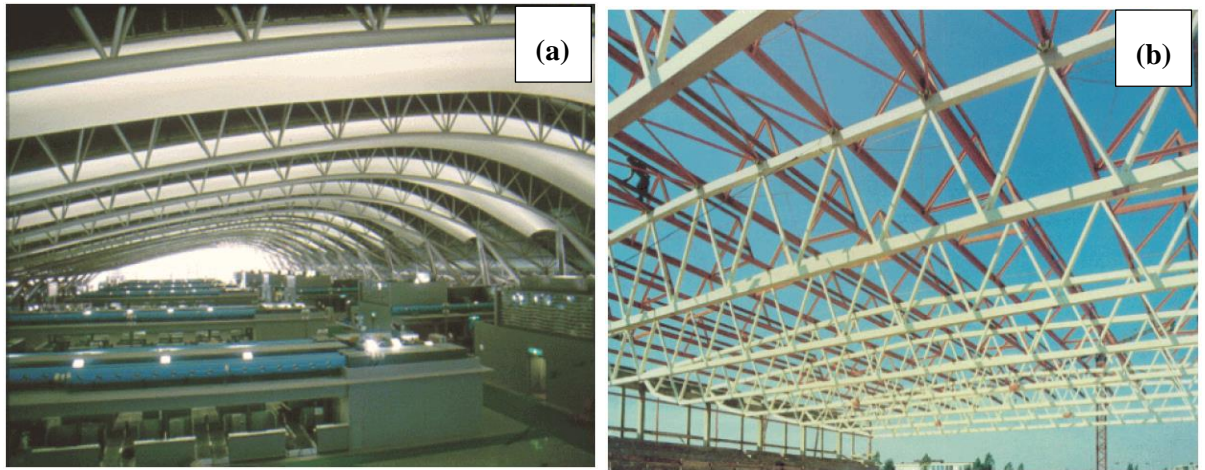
(a) Kansai airport roof, Japan (b) A roof with lattice girders (Wardnier, 2001)
